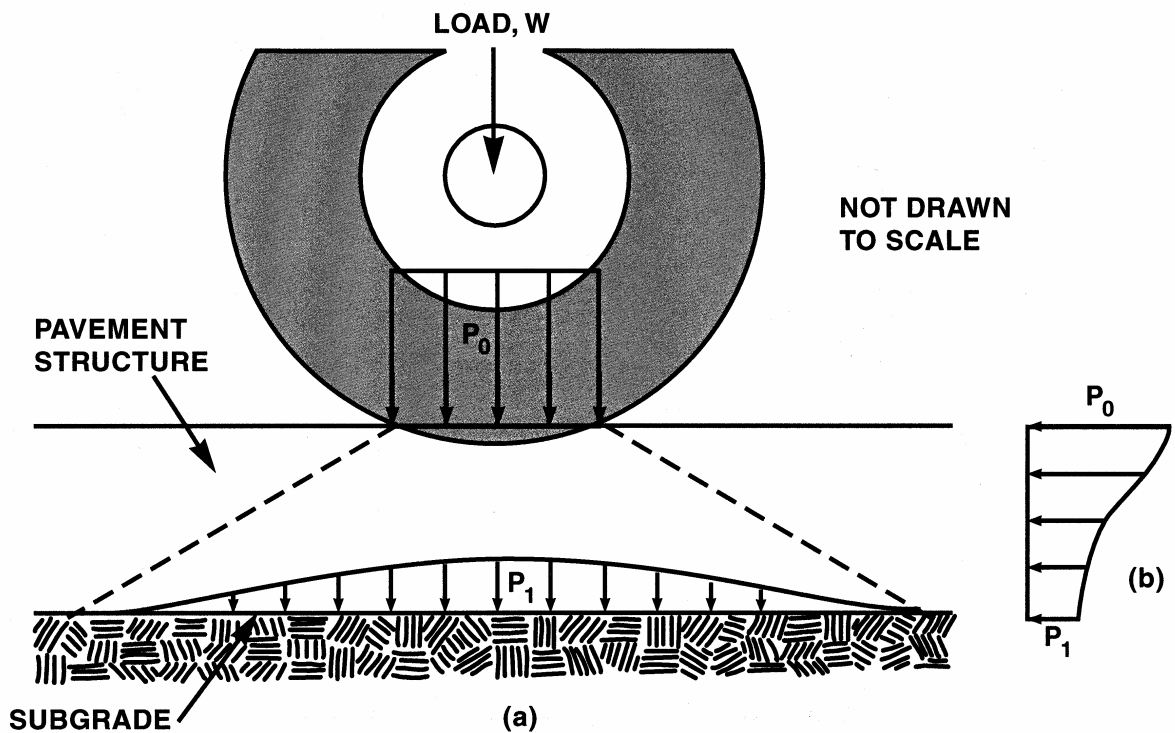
Spread of Wheel-Load through Pavement Structure
